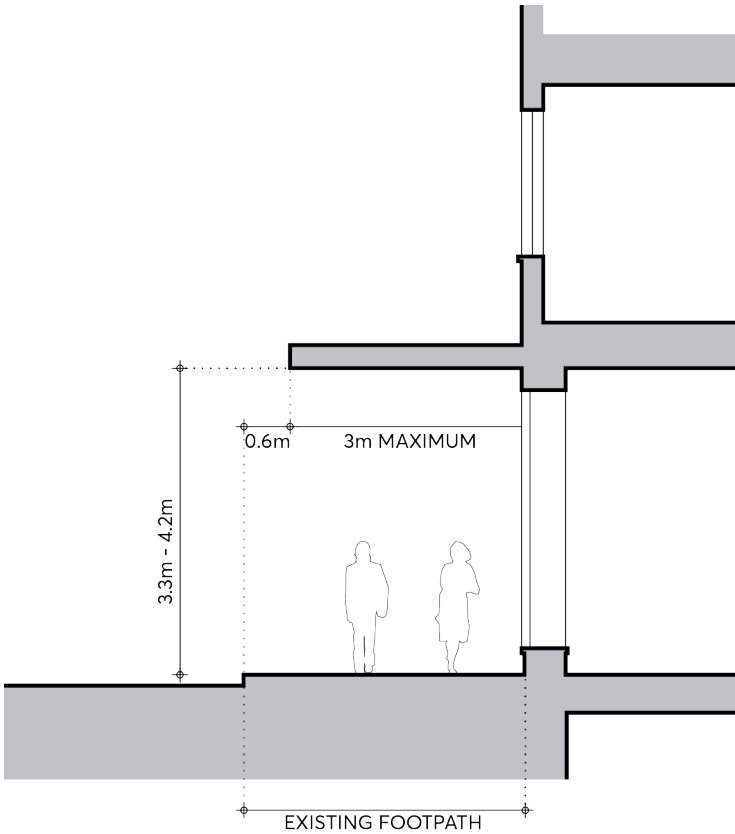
Detailed Section through Macquarie Street
